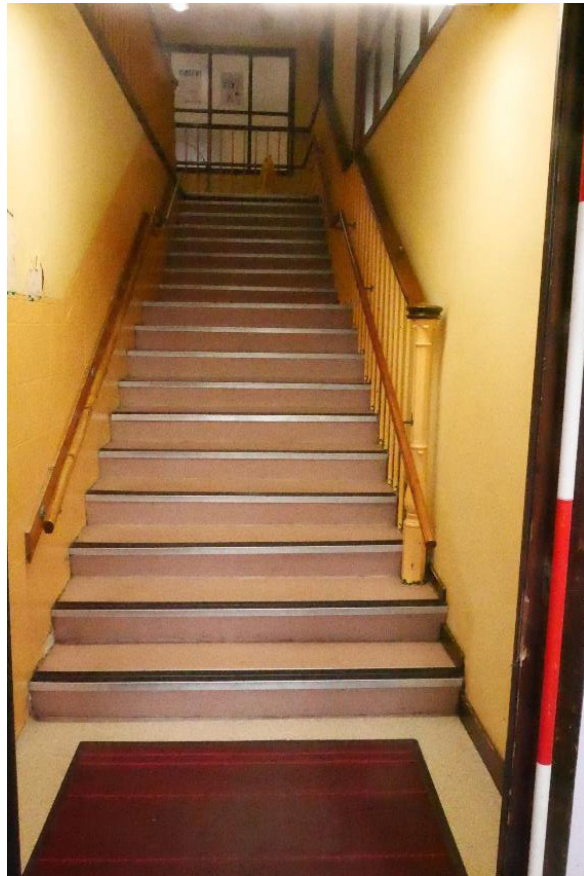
General view of stairs up to Mezzanine floor level from Room 0/1a (© Derek Hall 2023)
